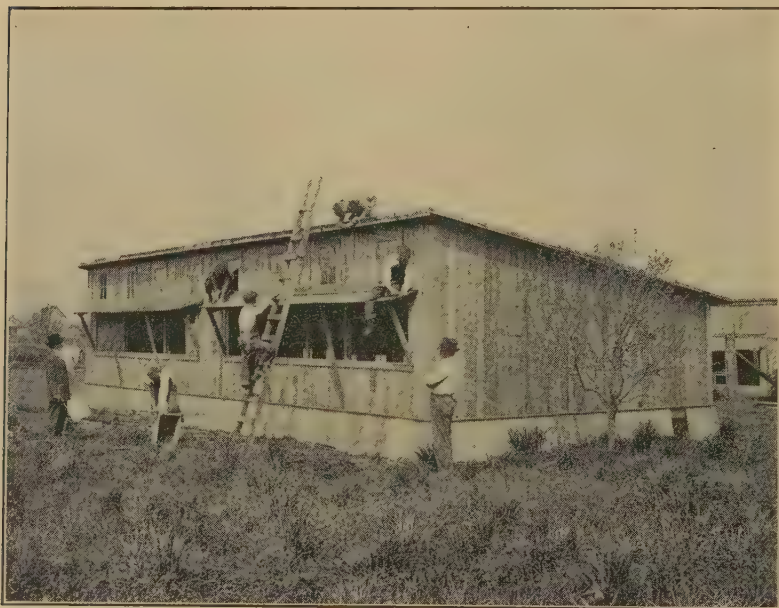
FRONT ELEVATION OF CHICKEN HOUSE 20' $\times$ 40'
